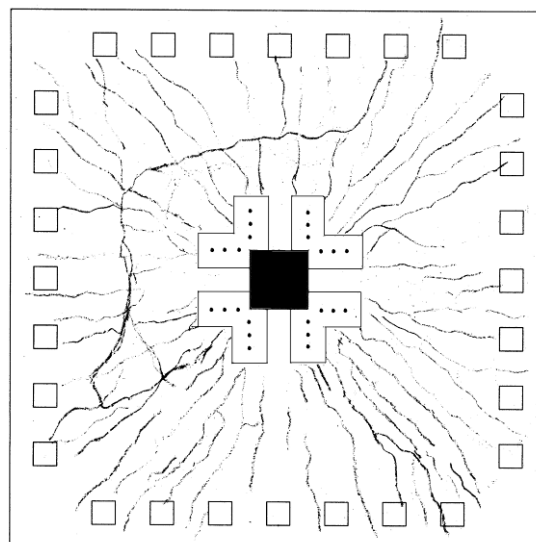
Failure surfaces and crack patterns of specimen R1
